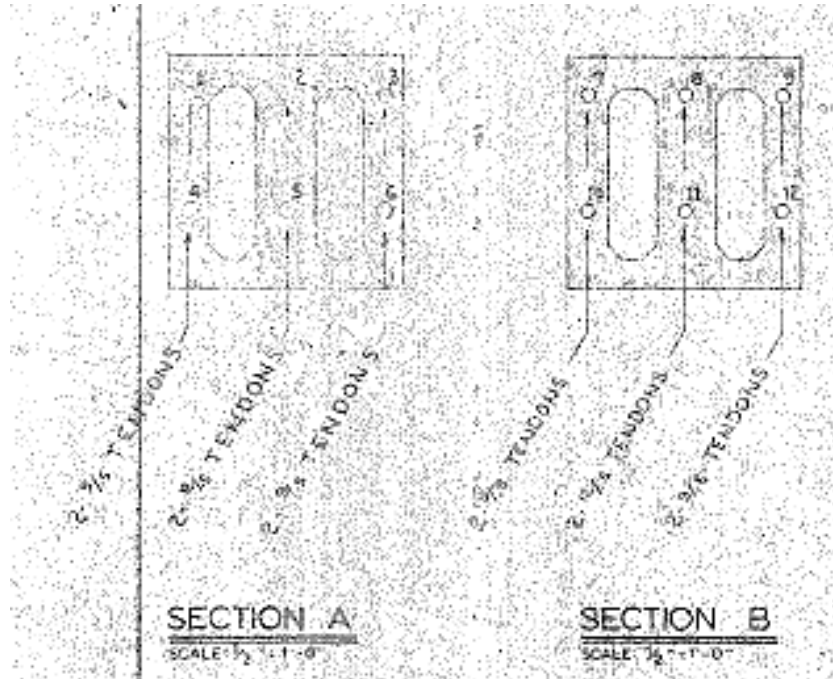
Rail Girder Post-Tensioning Arrangement (Con-force DWG 2176-1)
